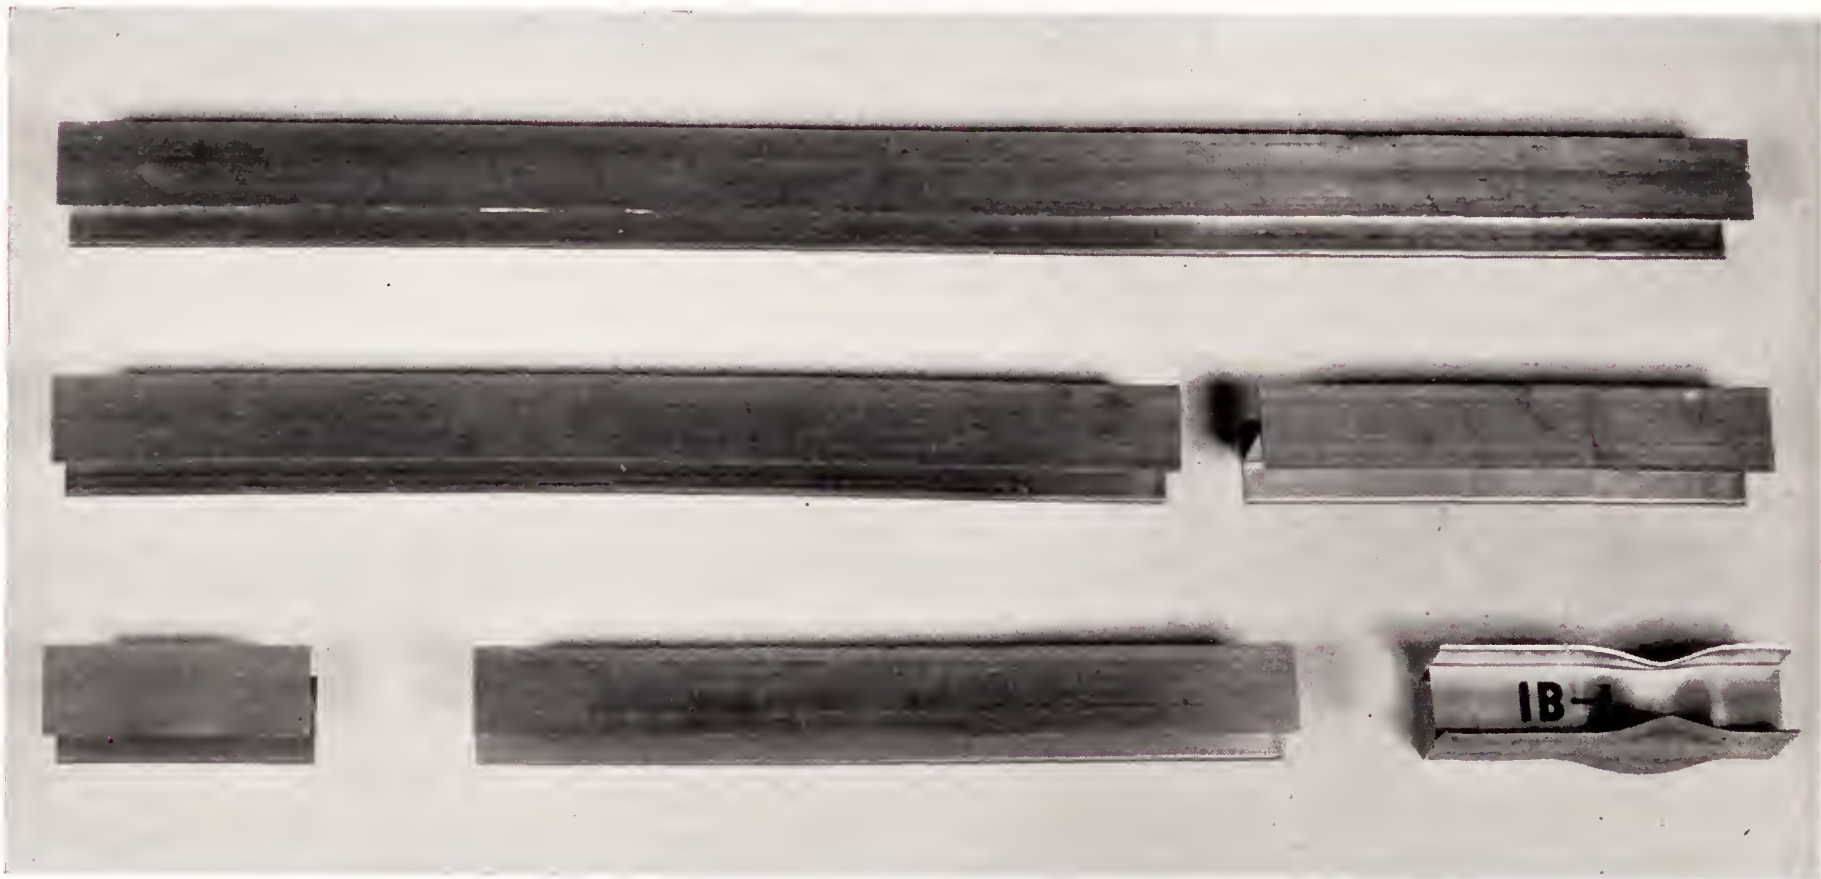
Some column specimens and one compressive specimen (1B-1) of cross section A after test.
